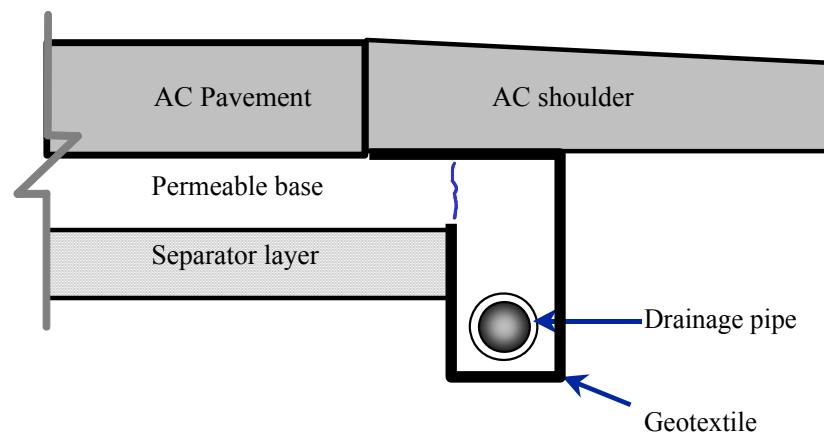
The recommended design of AC pavement with a permeable base (ERES, 1999).
